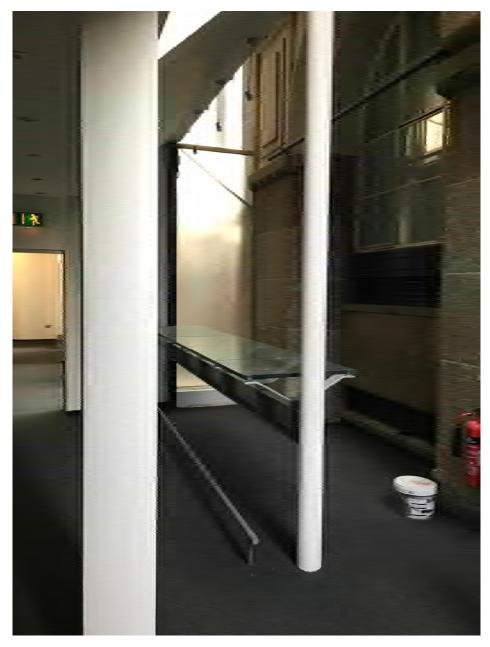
Showing ground condition of link between theatre and Lethaby Building
